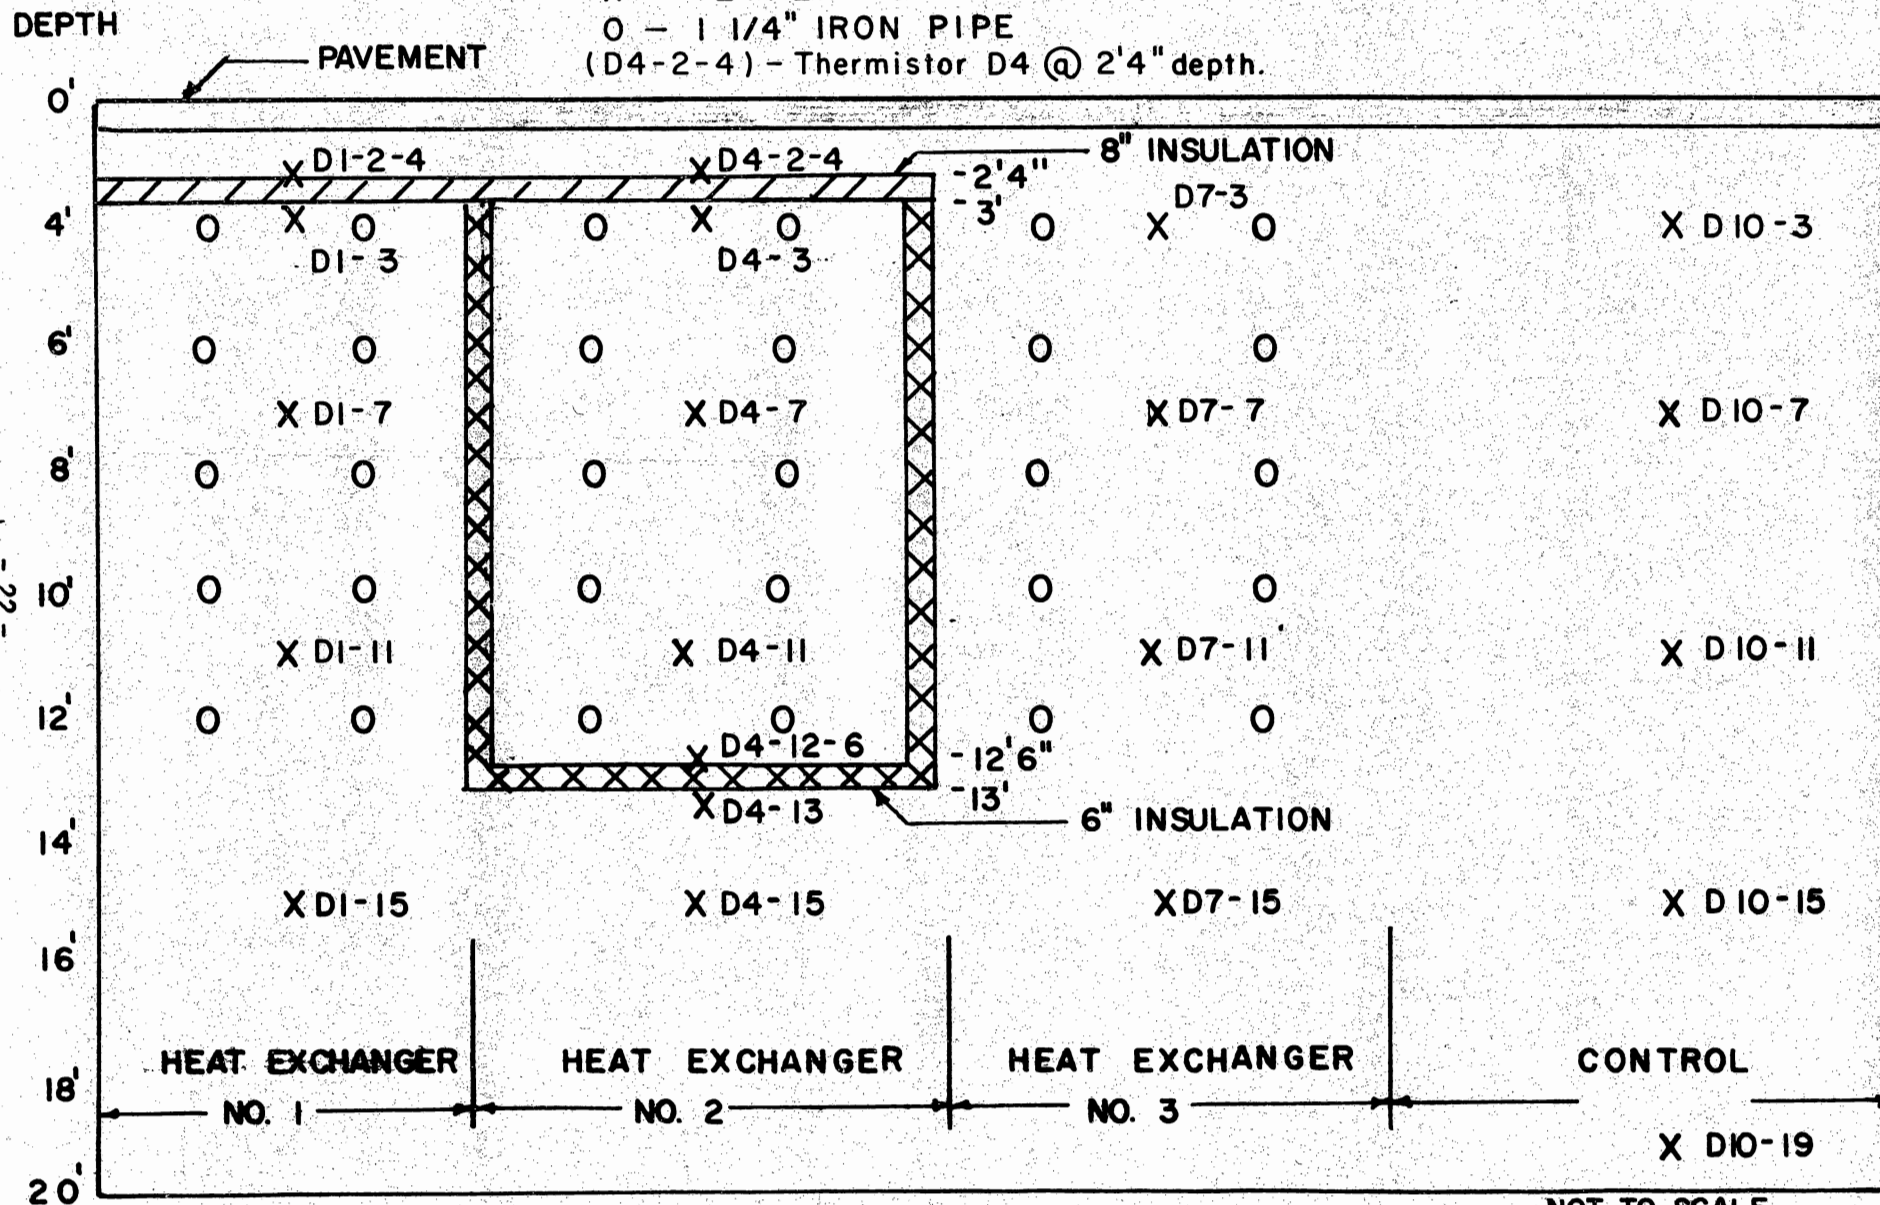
TYPE "D" SENSOR ASSEMBLIES
